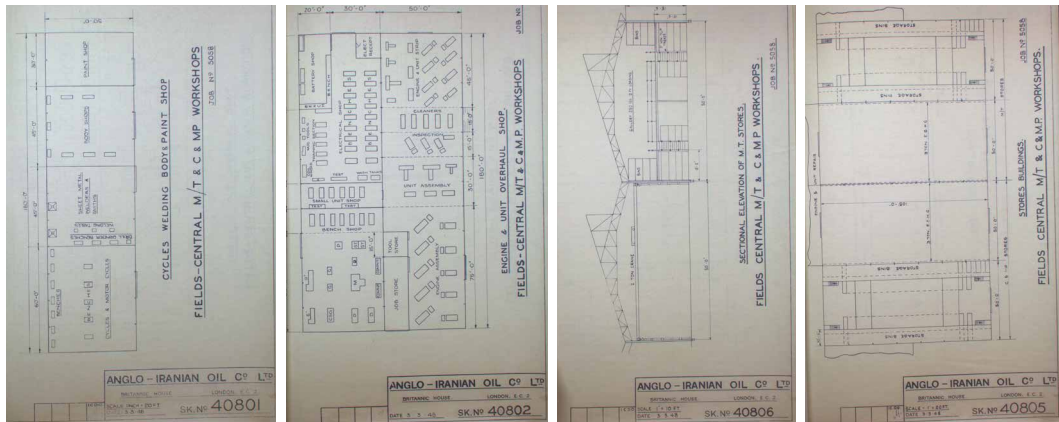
Workshops Plans & Sections made for AIOC in Britannic House, London.
